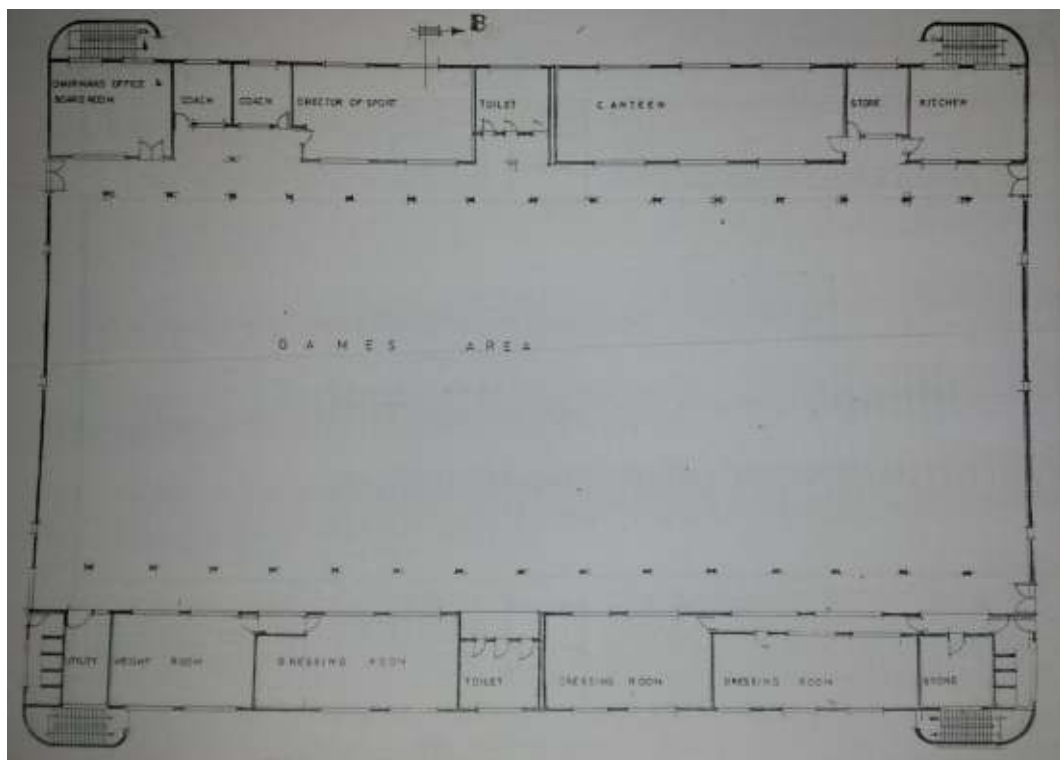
Showing ground floor plan of UNILAG indoor sports hall.
